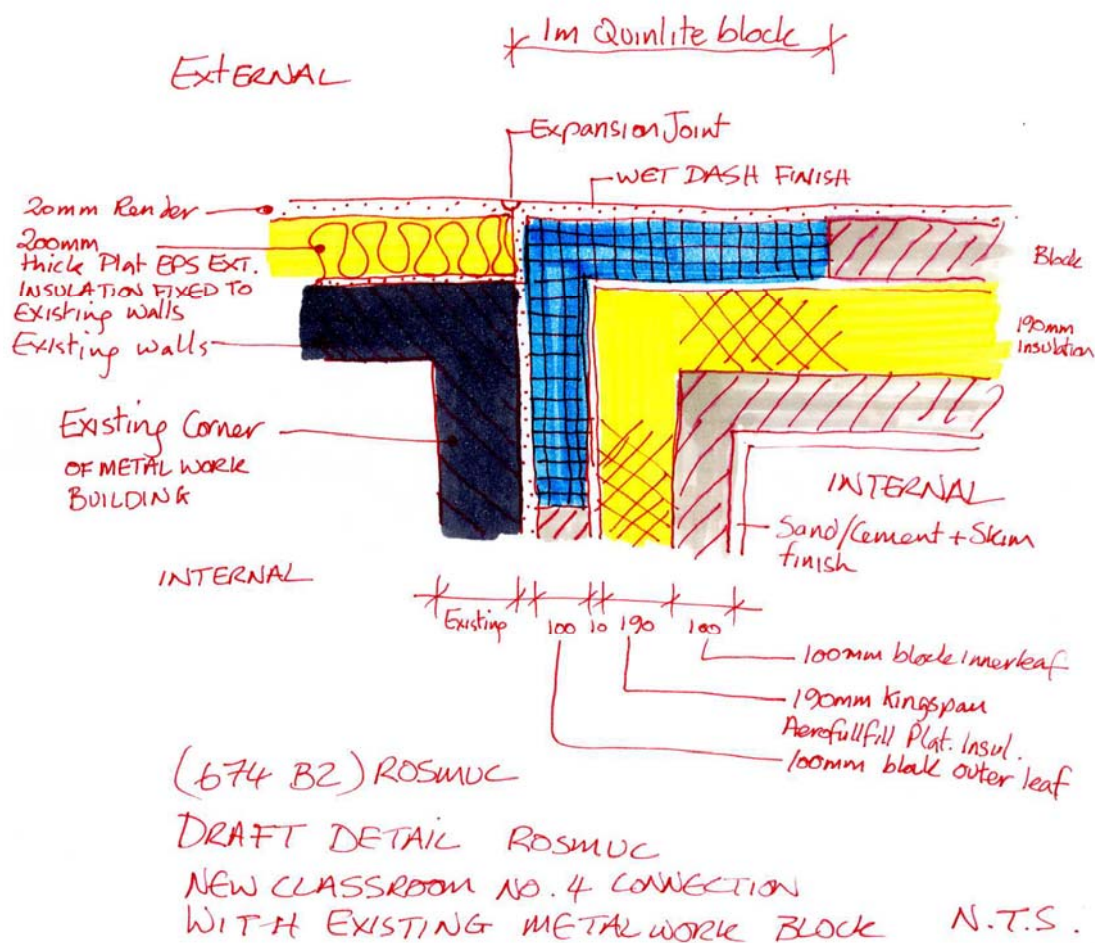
Detail of new classroom extension wall connection to existing wall in plan - not to scale [MosArt, 2014]
